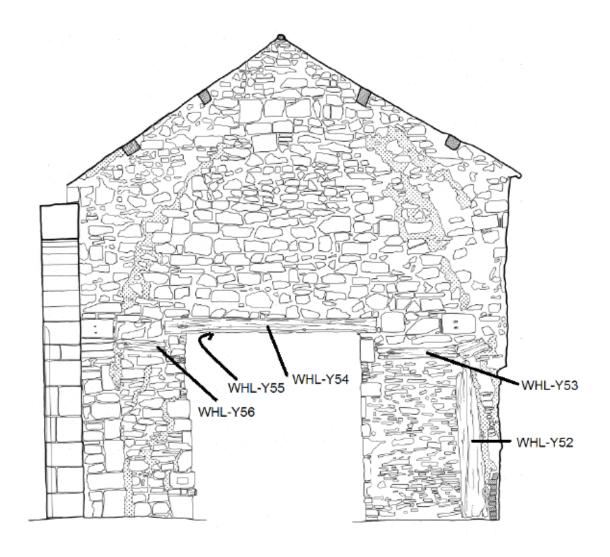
Dividing wall between carriage house and lobby (east face), showing the location of samples WHL-Y52-56 (LUAU 1997)
